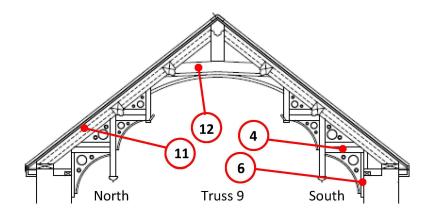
Sections through the nave roof trusses to locate sampled timbers
